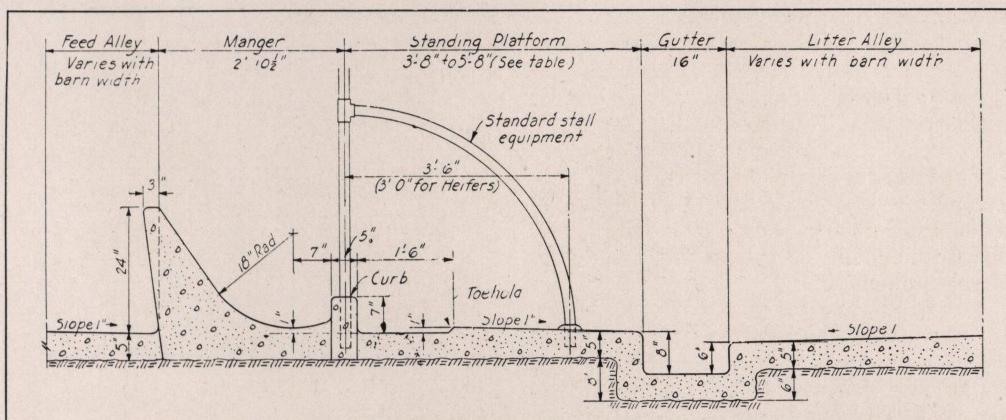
Cross section of standard dairy barn floor. Construction notes: Place concrete directly on well-drained soil; place on 6-inch cinder or gravel fill on poorly drained soil. All surfaces float finished except manger, feed alley and gutter, which are trowel finished; all edges rounded
